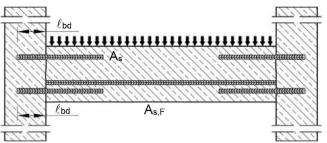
Overlapping joint for rebar connections of slabs and beams
